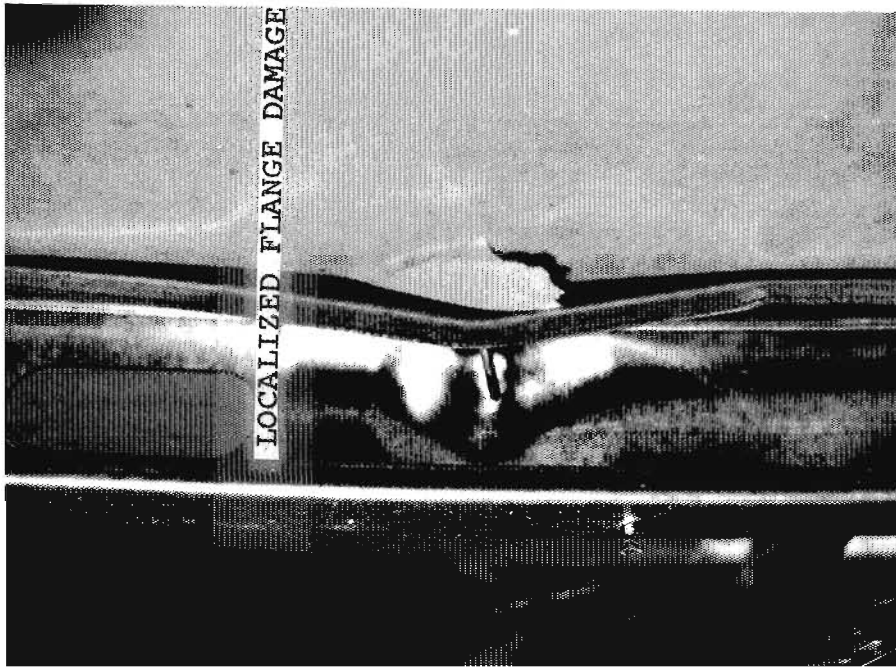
STEEL STUD FLEXURAL FAILURE -
